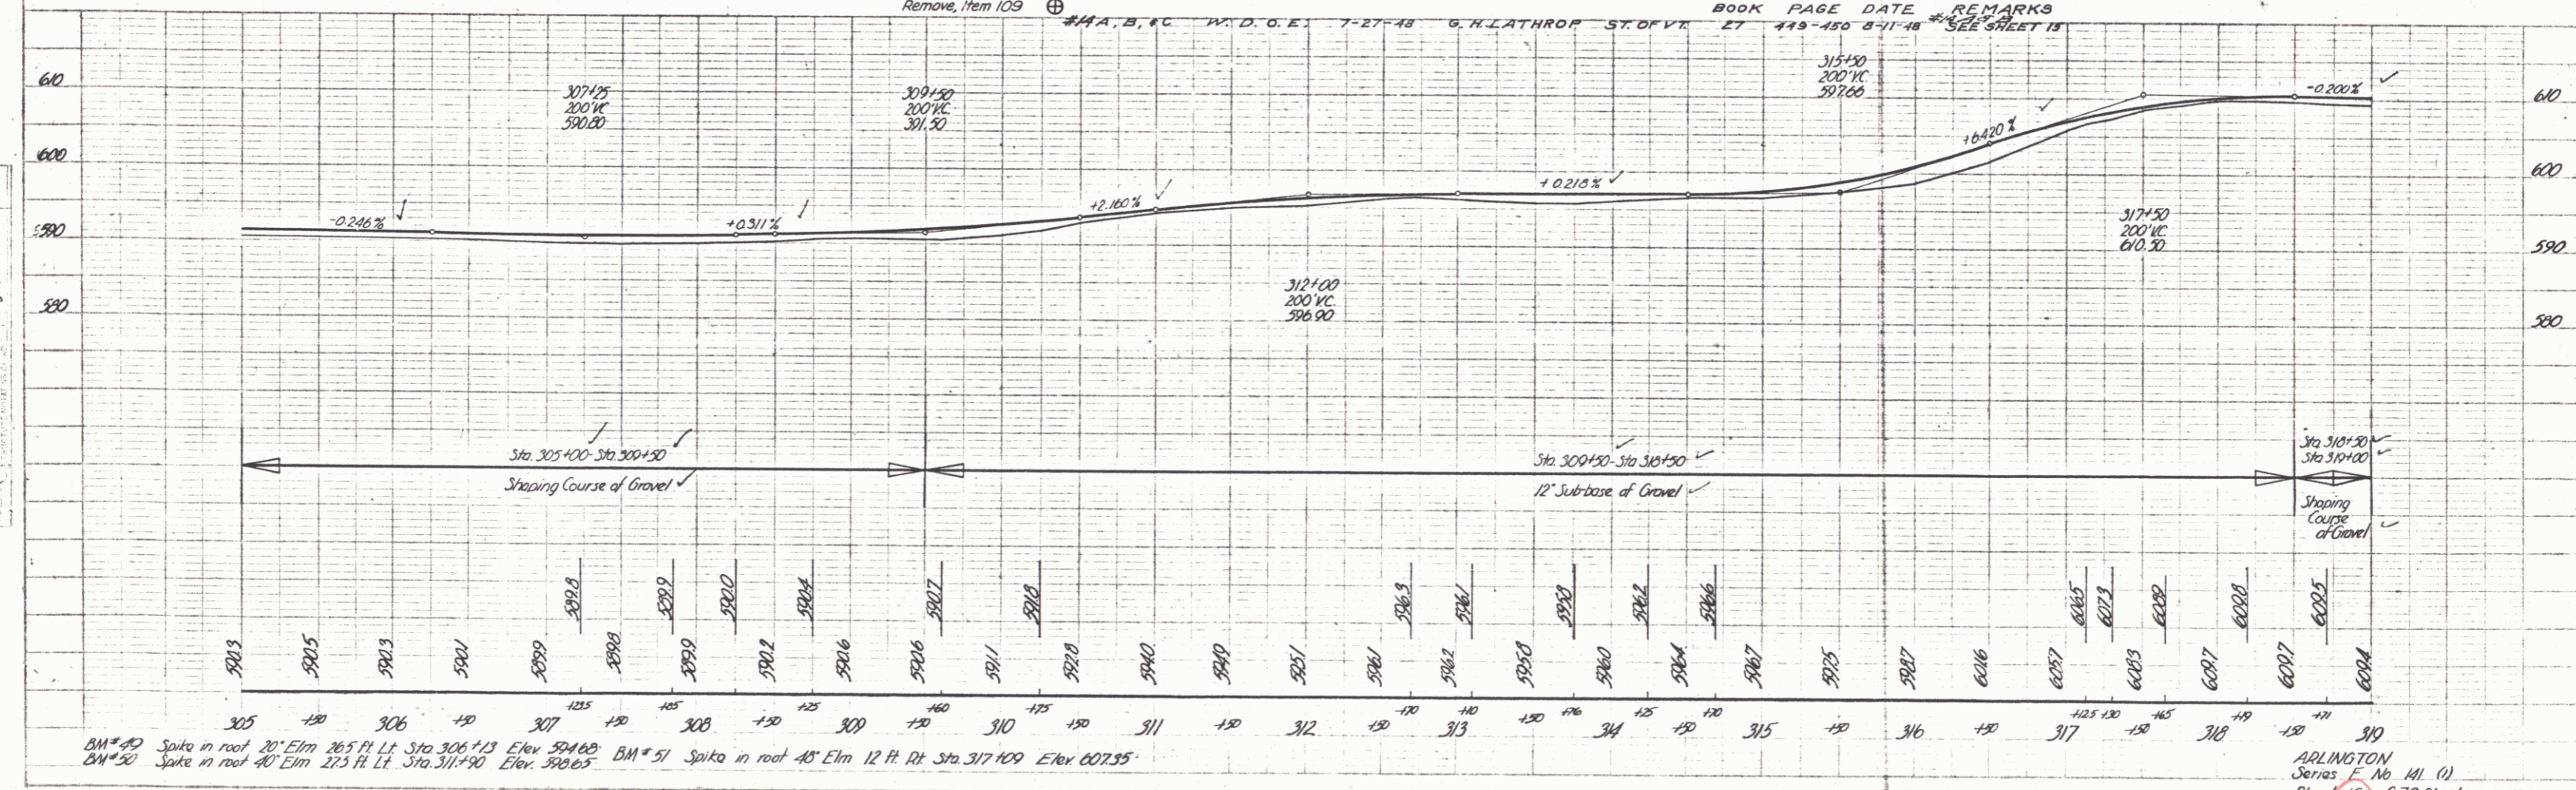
PLAN - PROFILE & P.A.S. & STANDARDS
